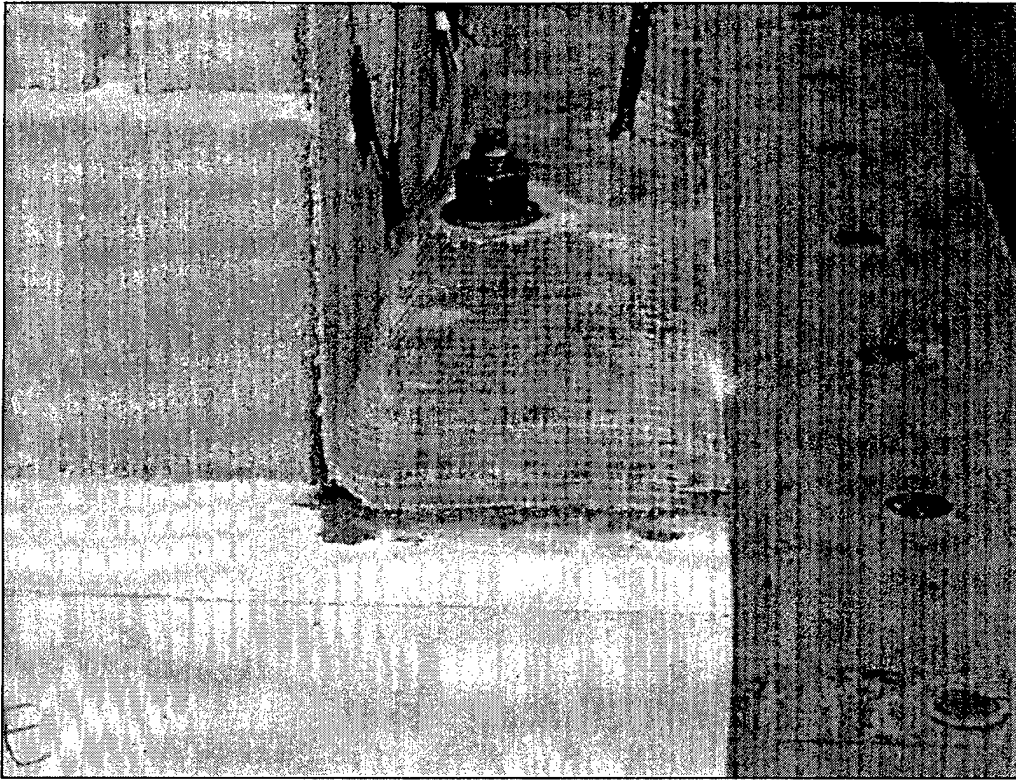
FIBRWRAP™ as applied on the wall and the concrete base beam.
